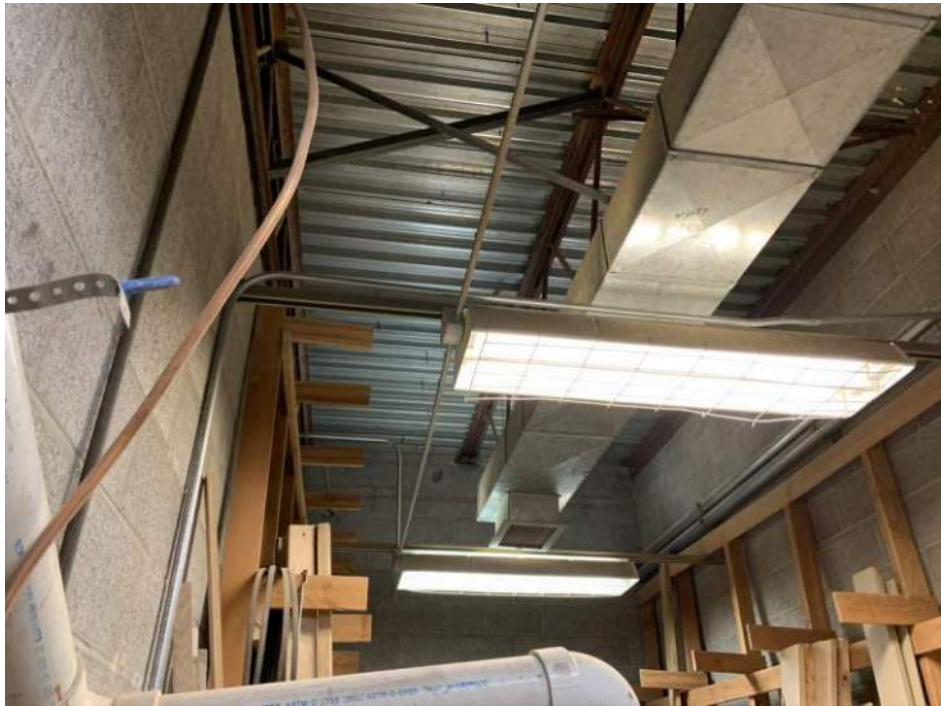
Roof Framing Above Wood Shop (1974 Addition)
